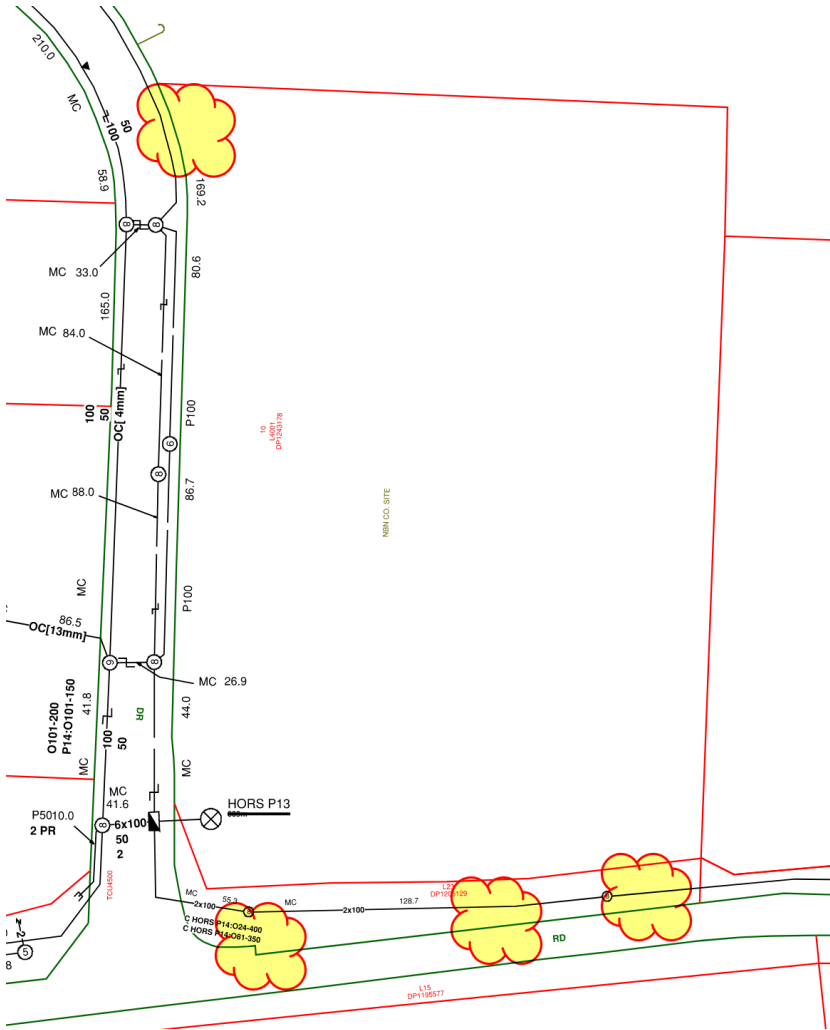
Telstra BYDA Plan (Telco Site Connection Points Highlighted)
